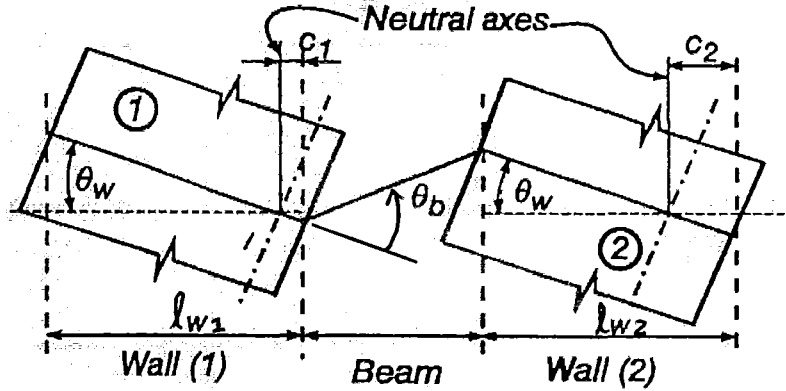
Relationship between cracked reinforced concrete walls and coupling beam rotation
